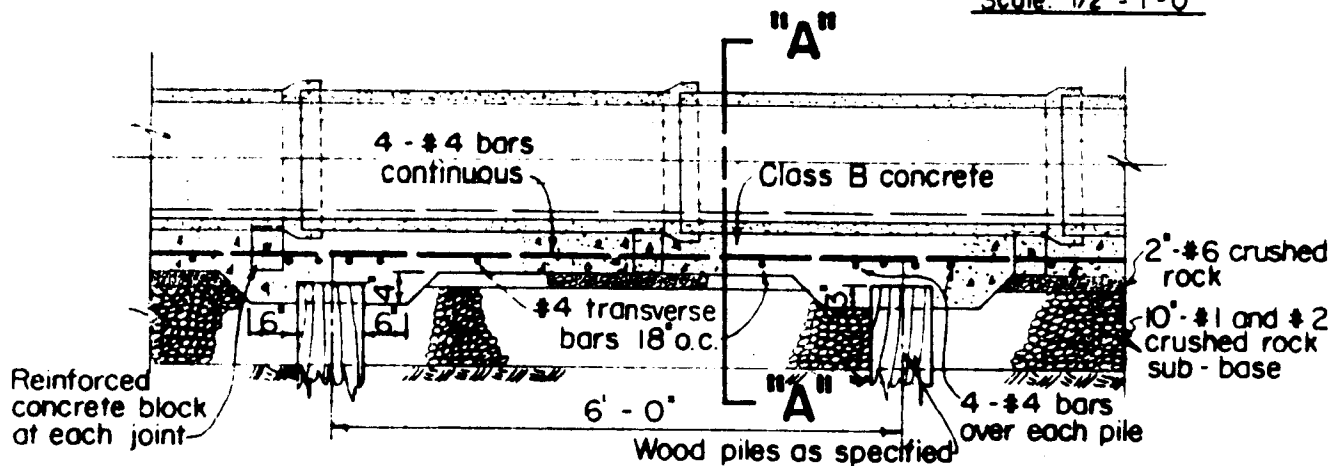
DETAIL OF CONCRETE JACKET FOR PIPES 12" AND SMALLER
